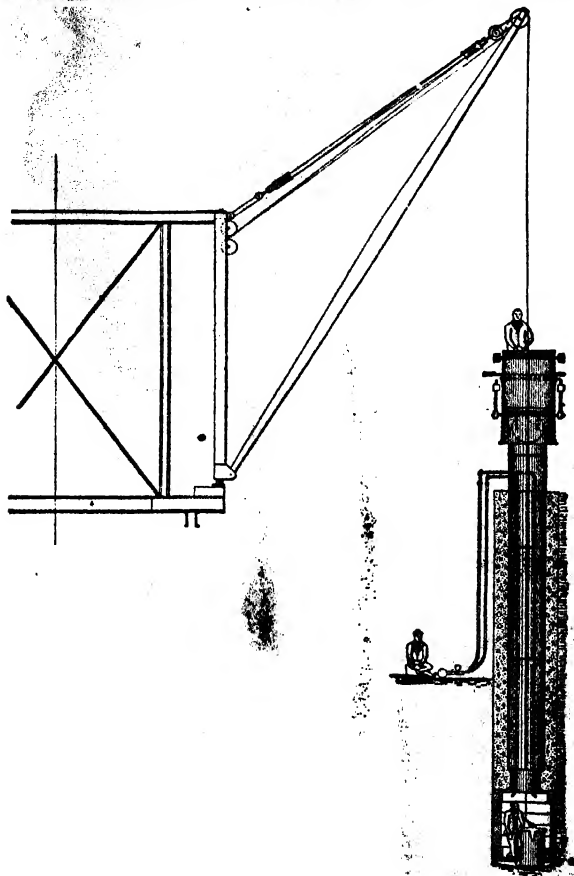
Diagrammatic sketch of section through a cylinder caisson under the Singer Building, New York.
